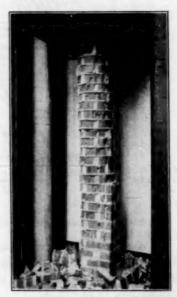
Failure of Waupaca Brick Column No. 25, the Strongest Tested.
